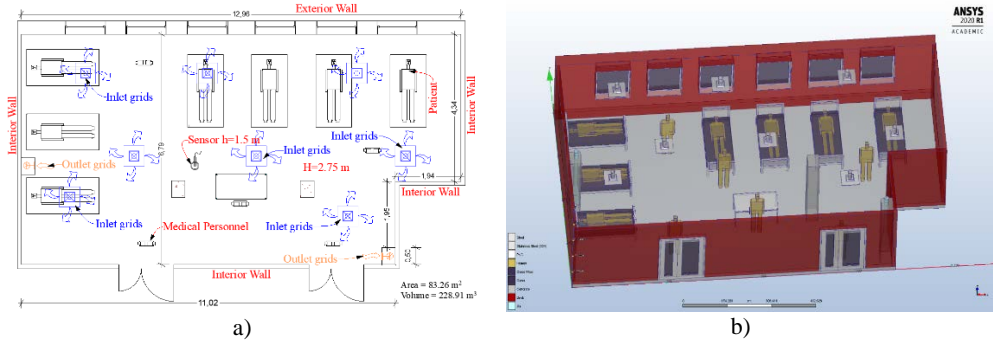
a) The floor plan of the proposed heating system b) The 3d zone model
